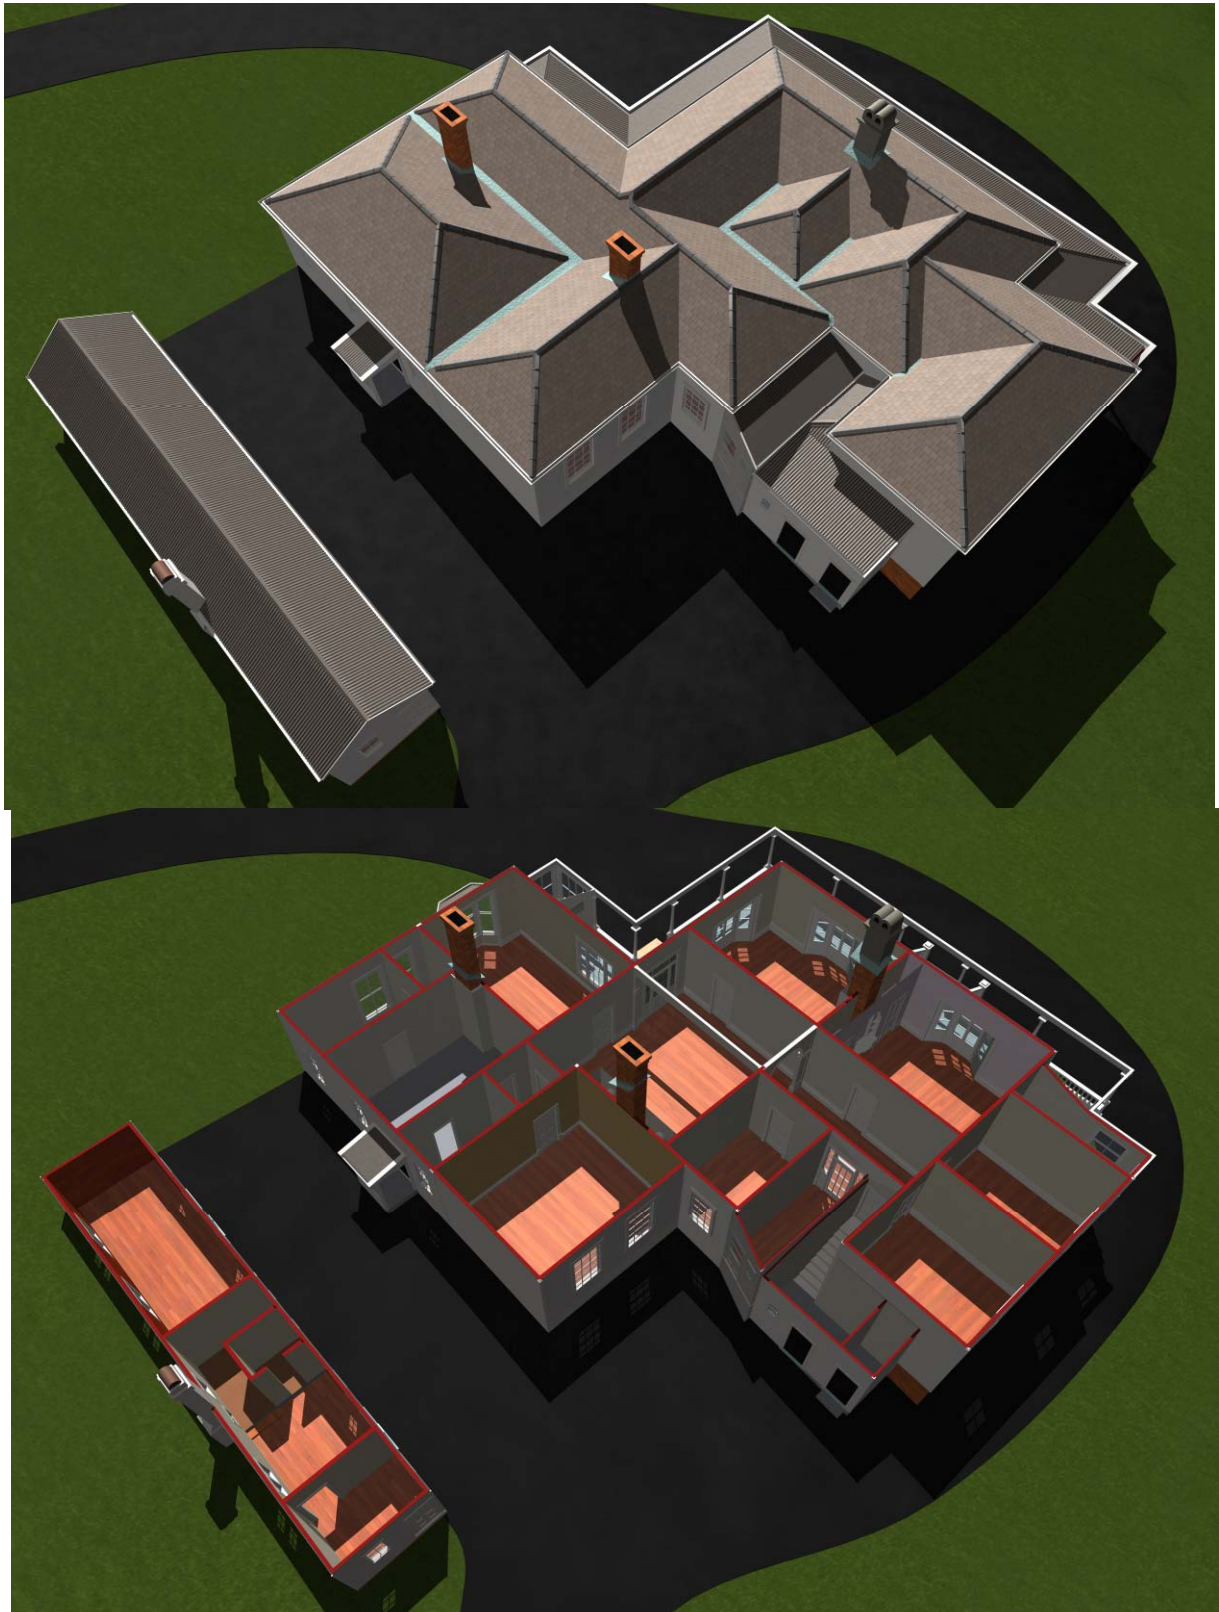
Oblique aerial views of the house and cottage, showing roof (top) and interior (bottom)
